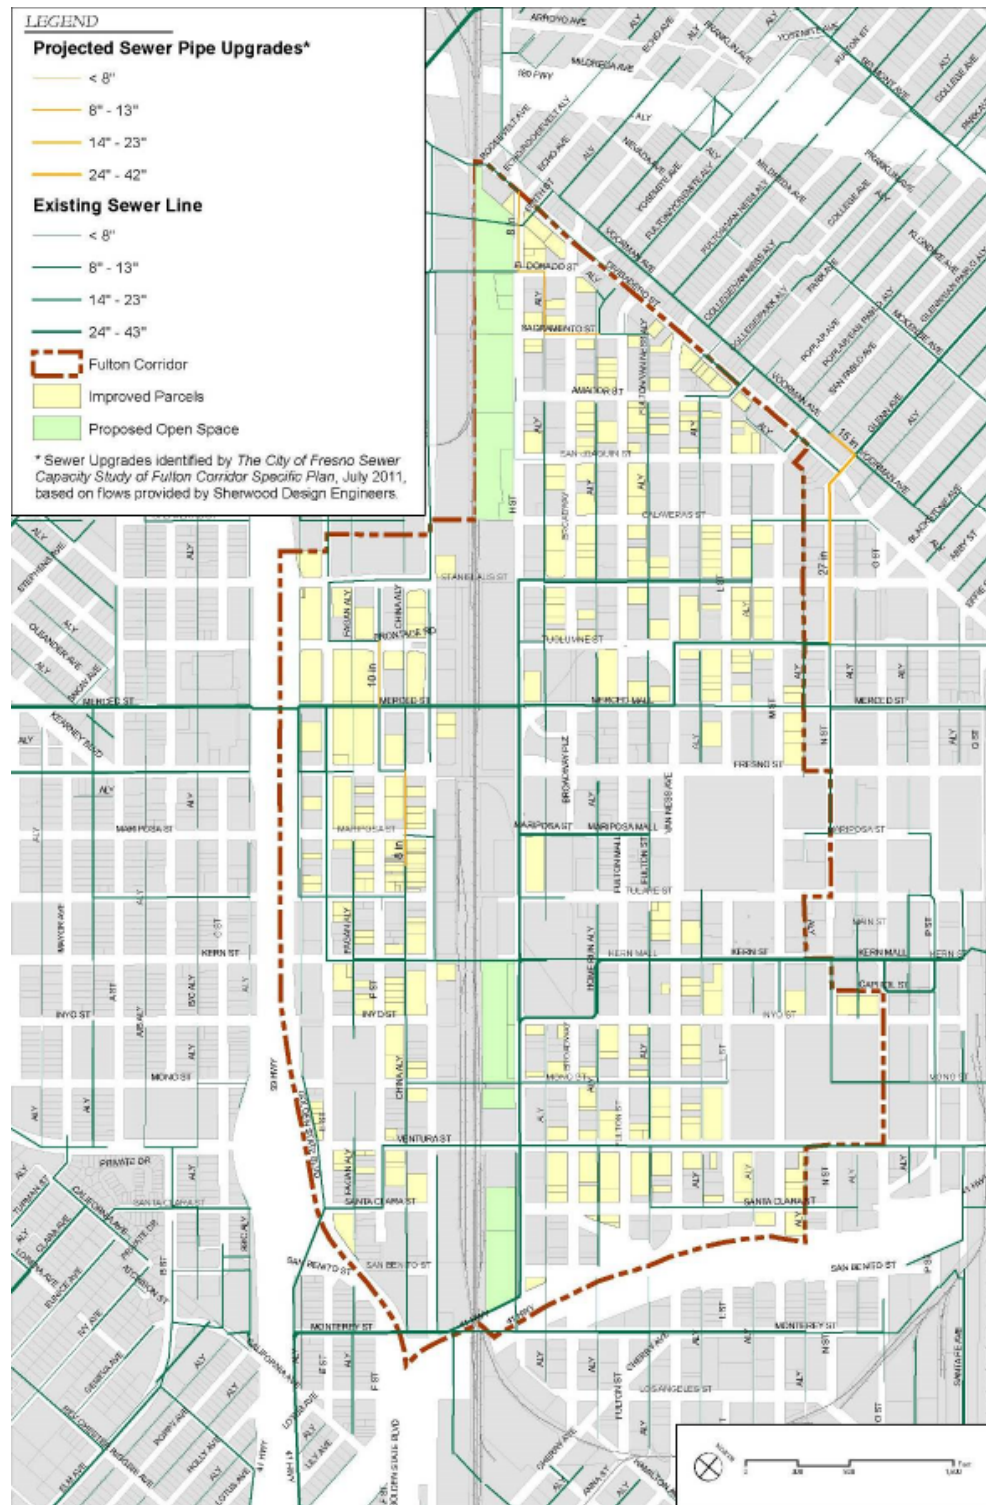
Sewer Infrastructure and Required Improvements—Specific Plan Area
